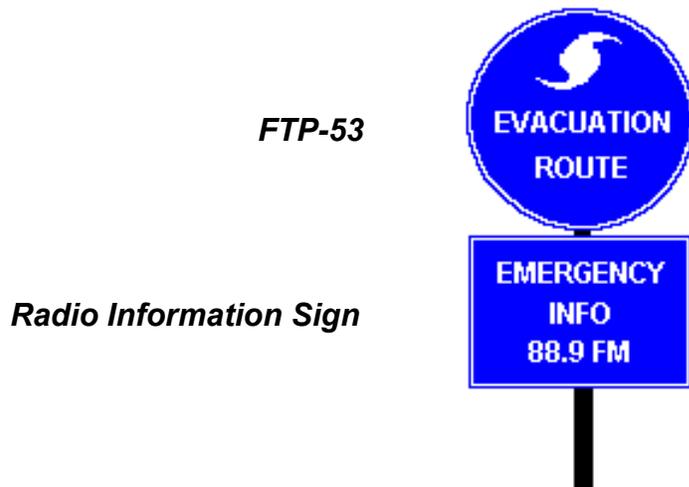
Radio Information Sign Detail - Non-limited Access Highways
